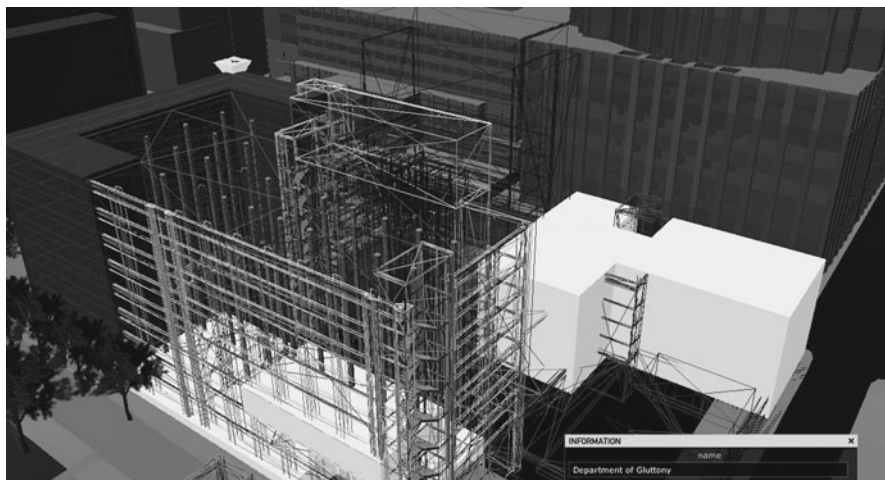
Wireframe revealing building interior layout, block diagram of use types
